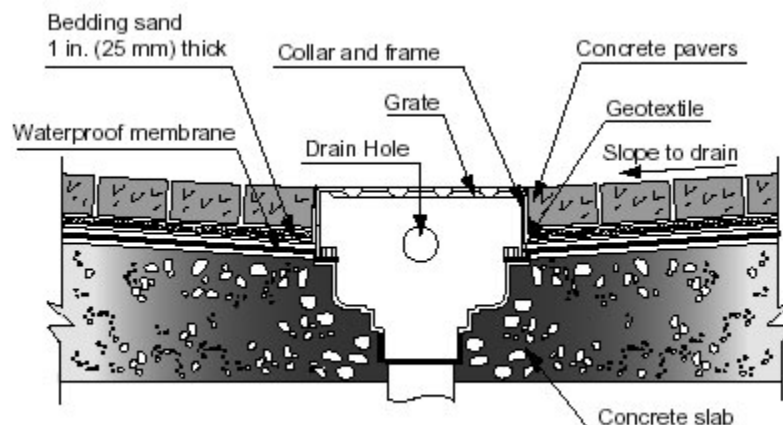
Roof drain with drain holes at bottom of bedding sand layer.
